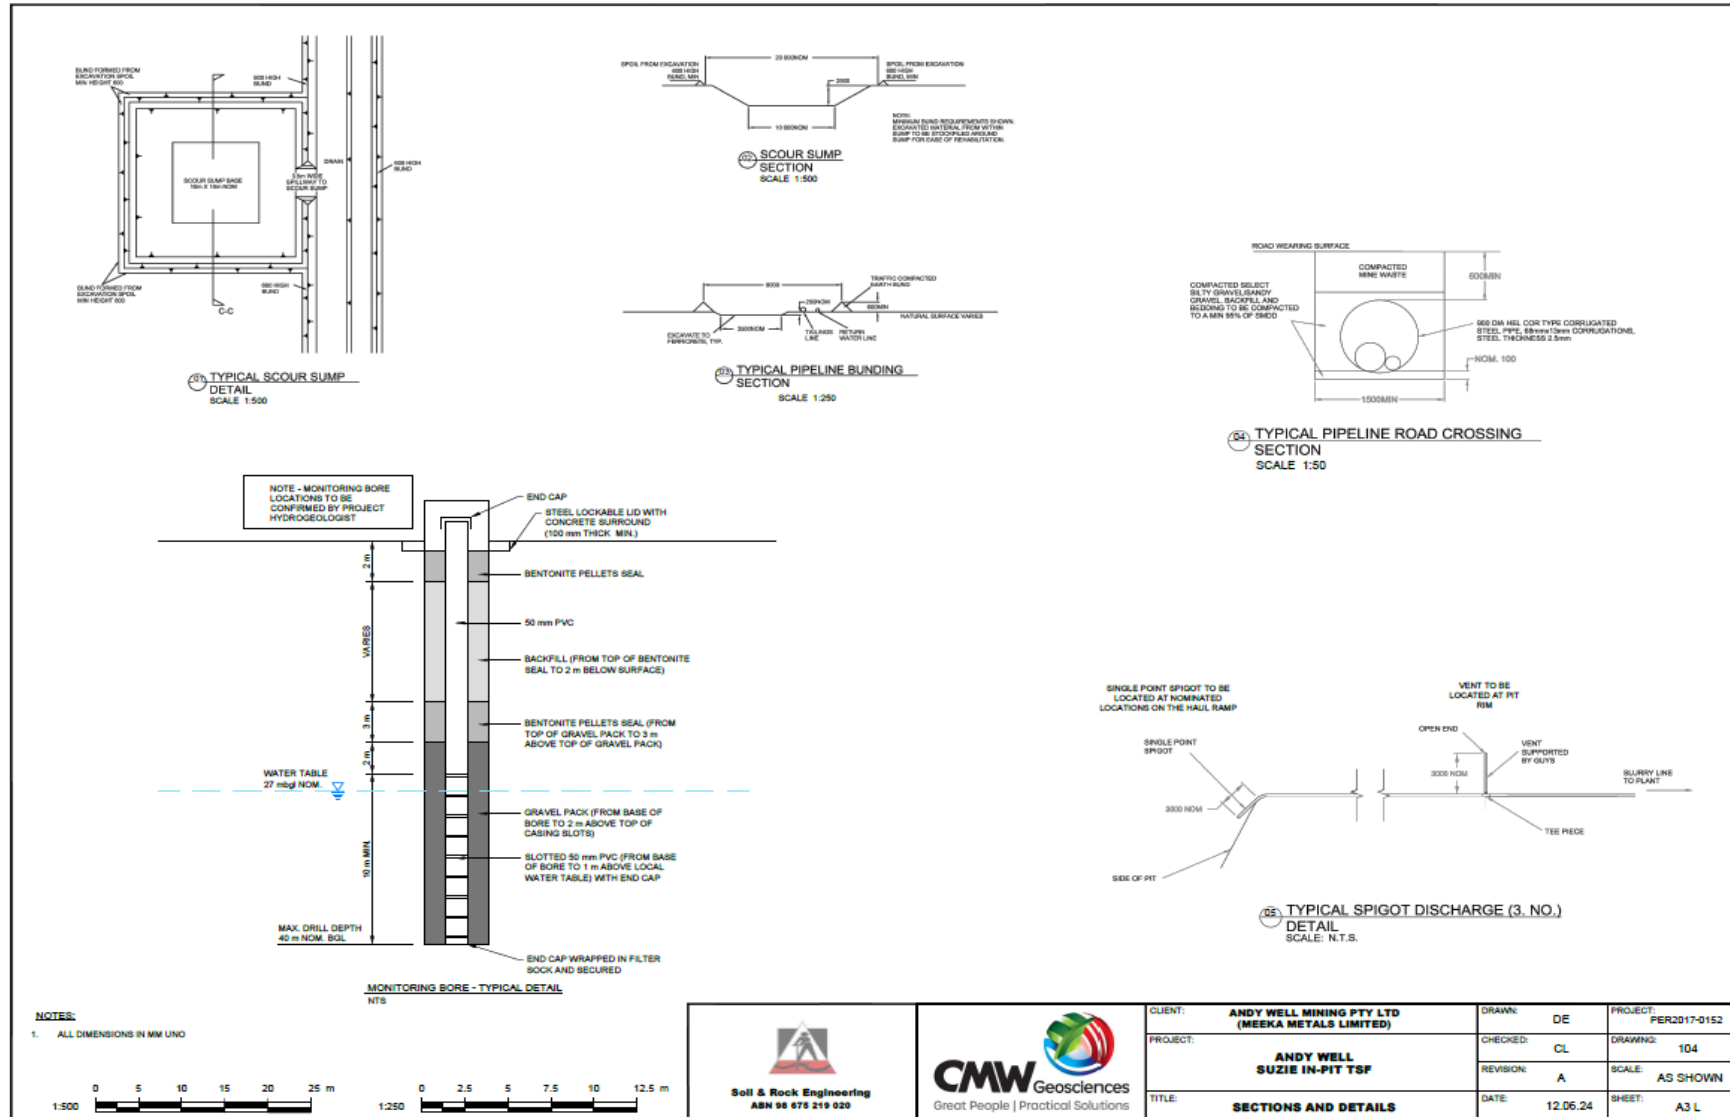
Monitoring bore and tailings discharge infrastructure construction and installation details
